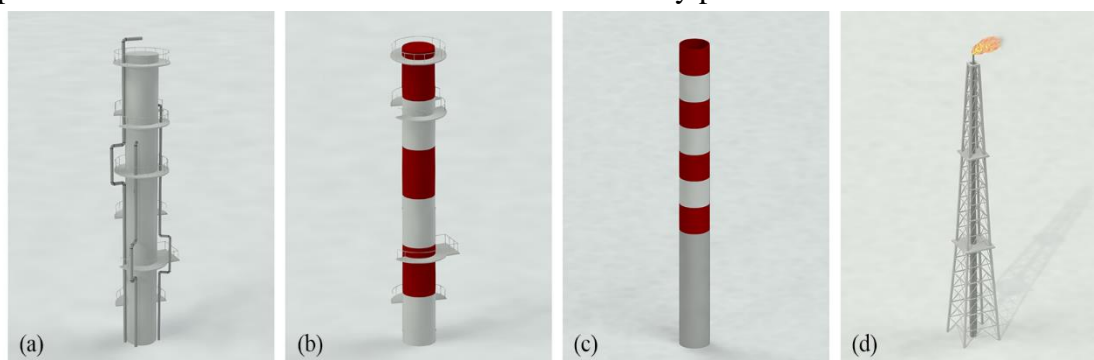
Schematic illustration of a (a) typical process tower, (b) typical steel chimney, (c) typical RC chimney, (d) typical flare supported by a lattice tower.
